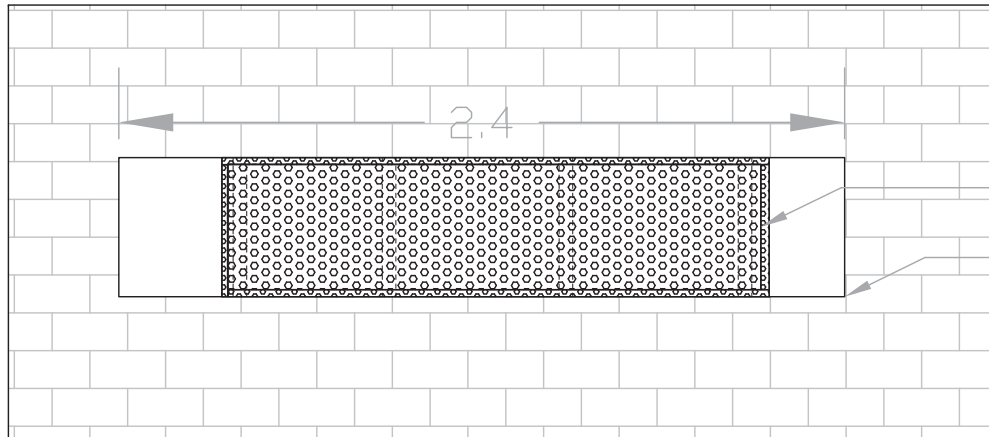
Bench without backrest. Section. Scale 1:25 (Author, 2008)
